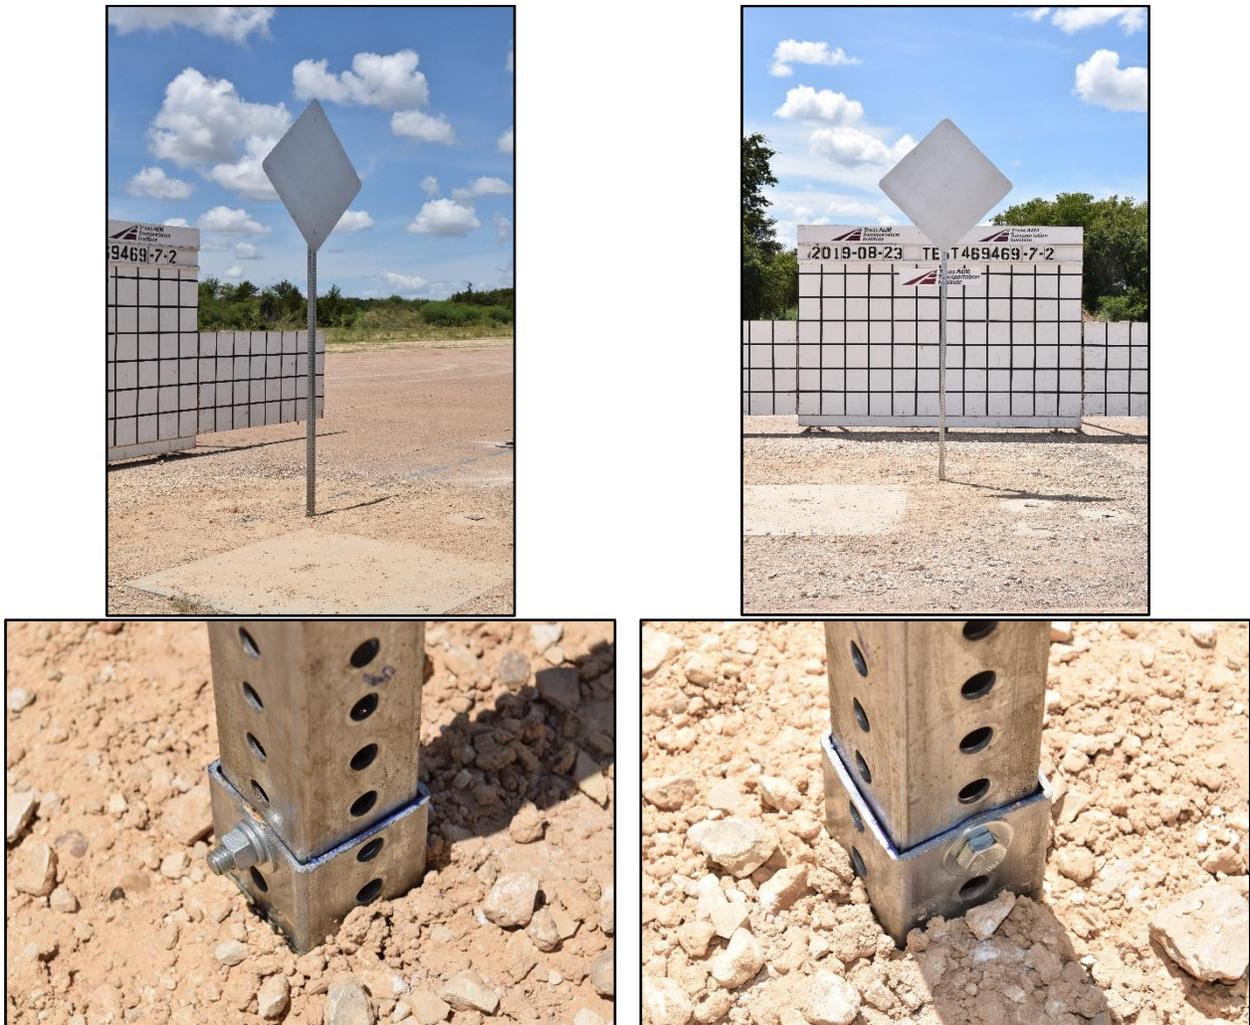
PSST Sign Support in Anchor Stub System prior to Test No. 469469-07-02.
